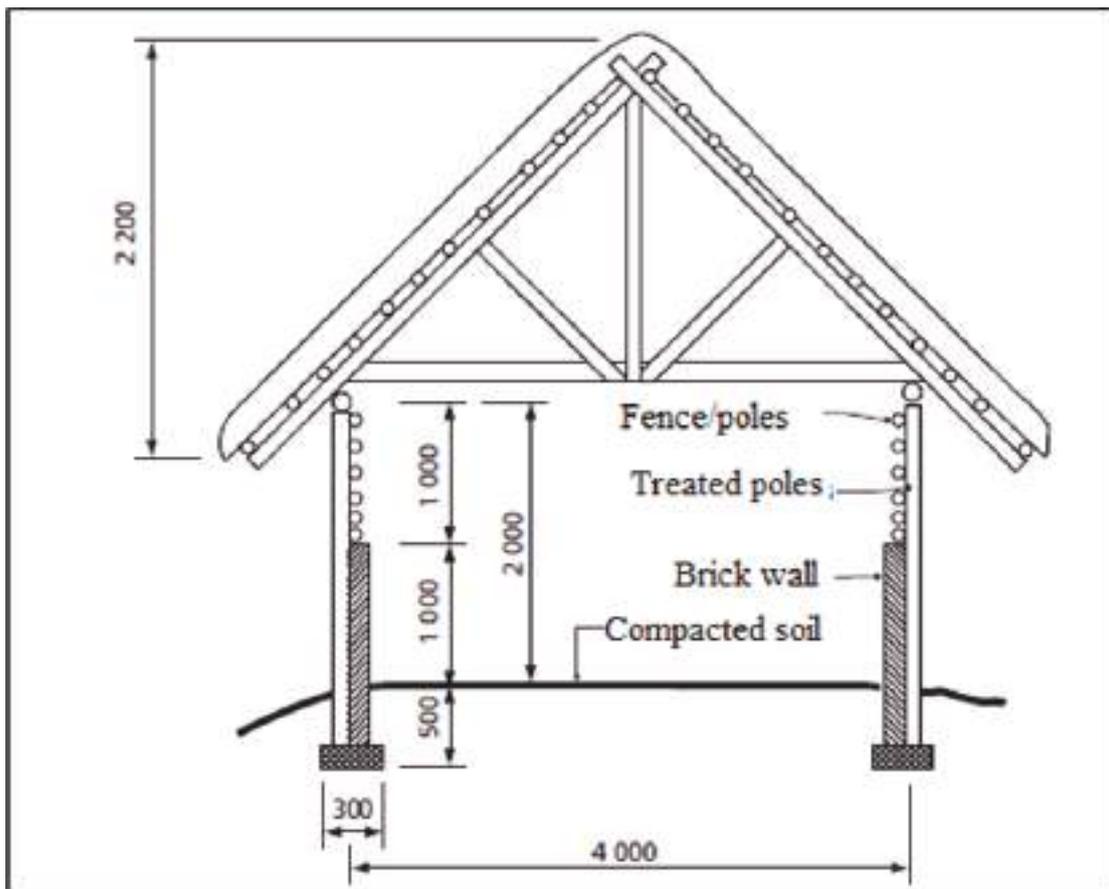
Walled and Roofed goat pen illustration (mm)
